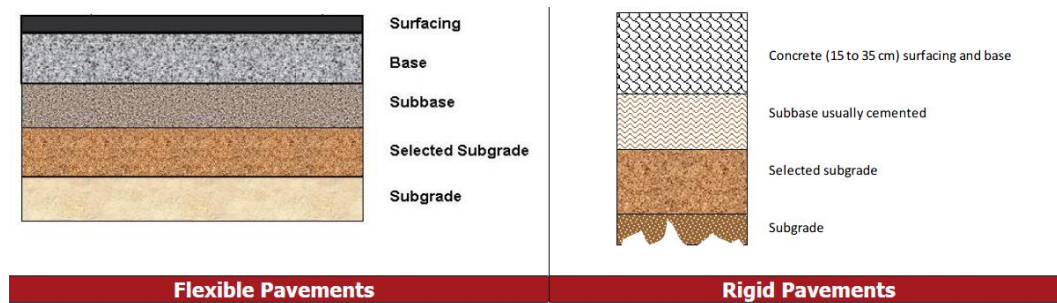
Typical South African Pavement Structures (South African National Road Agency, 2014)
